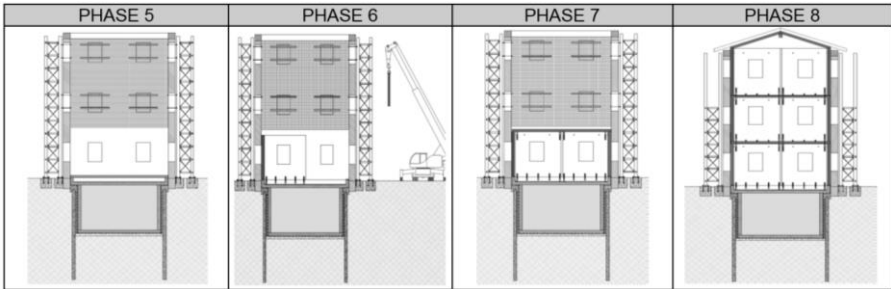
From the left: the realization of foundations, the assembling of pre-coupled CLT panels, the disassembling of the façades retaining structures and the connections between the old wall and the CLT.
